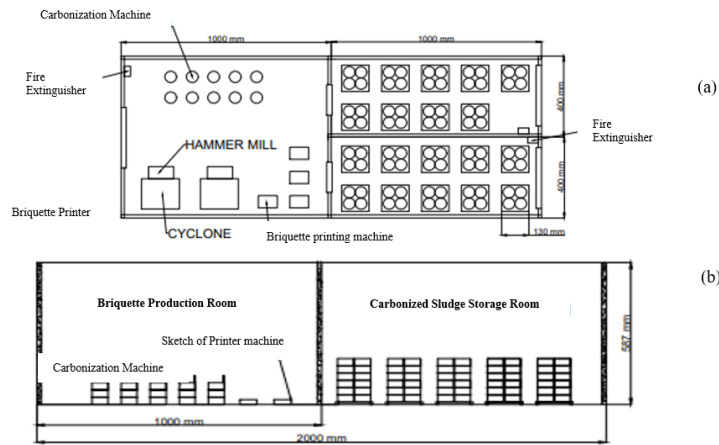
Design of the Production and Storage Building for Sludge Briquettes (a) Sketch, (b) Section
